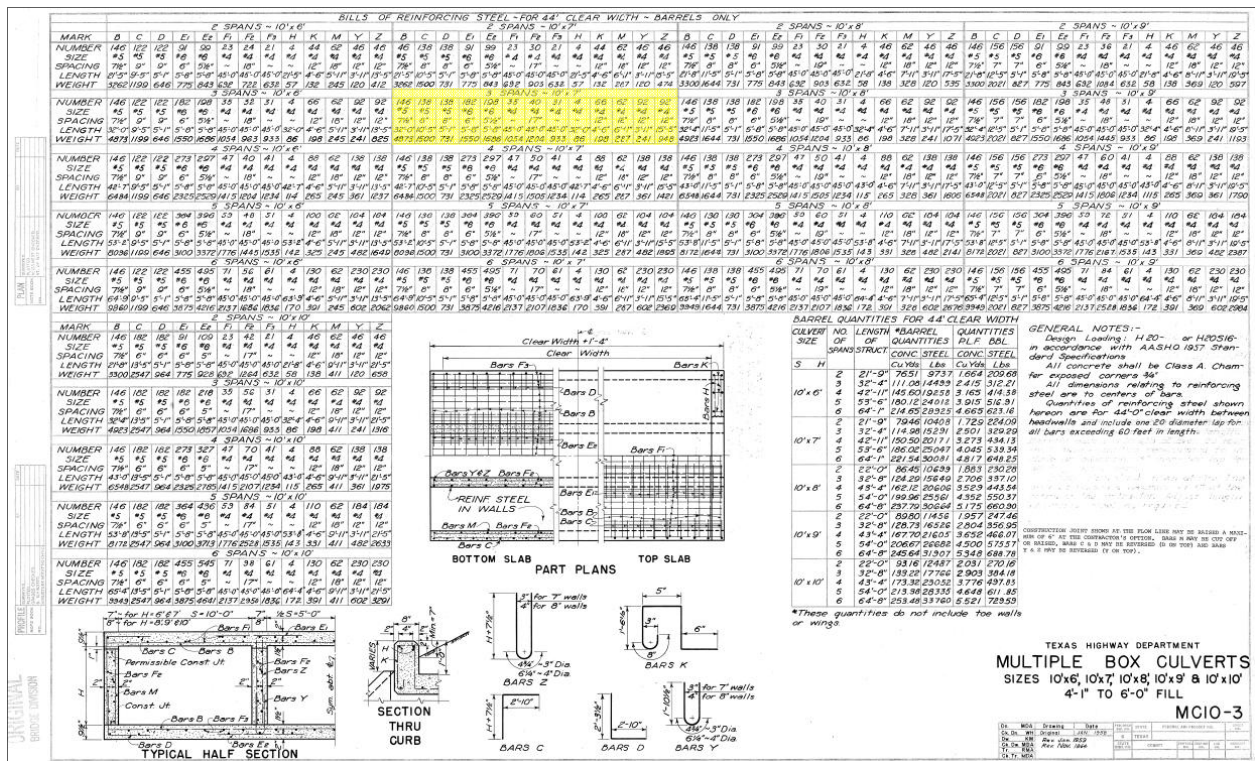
EXAMPLE CULVERT DESIGN SHEET.
